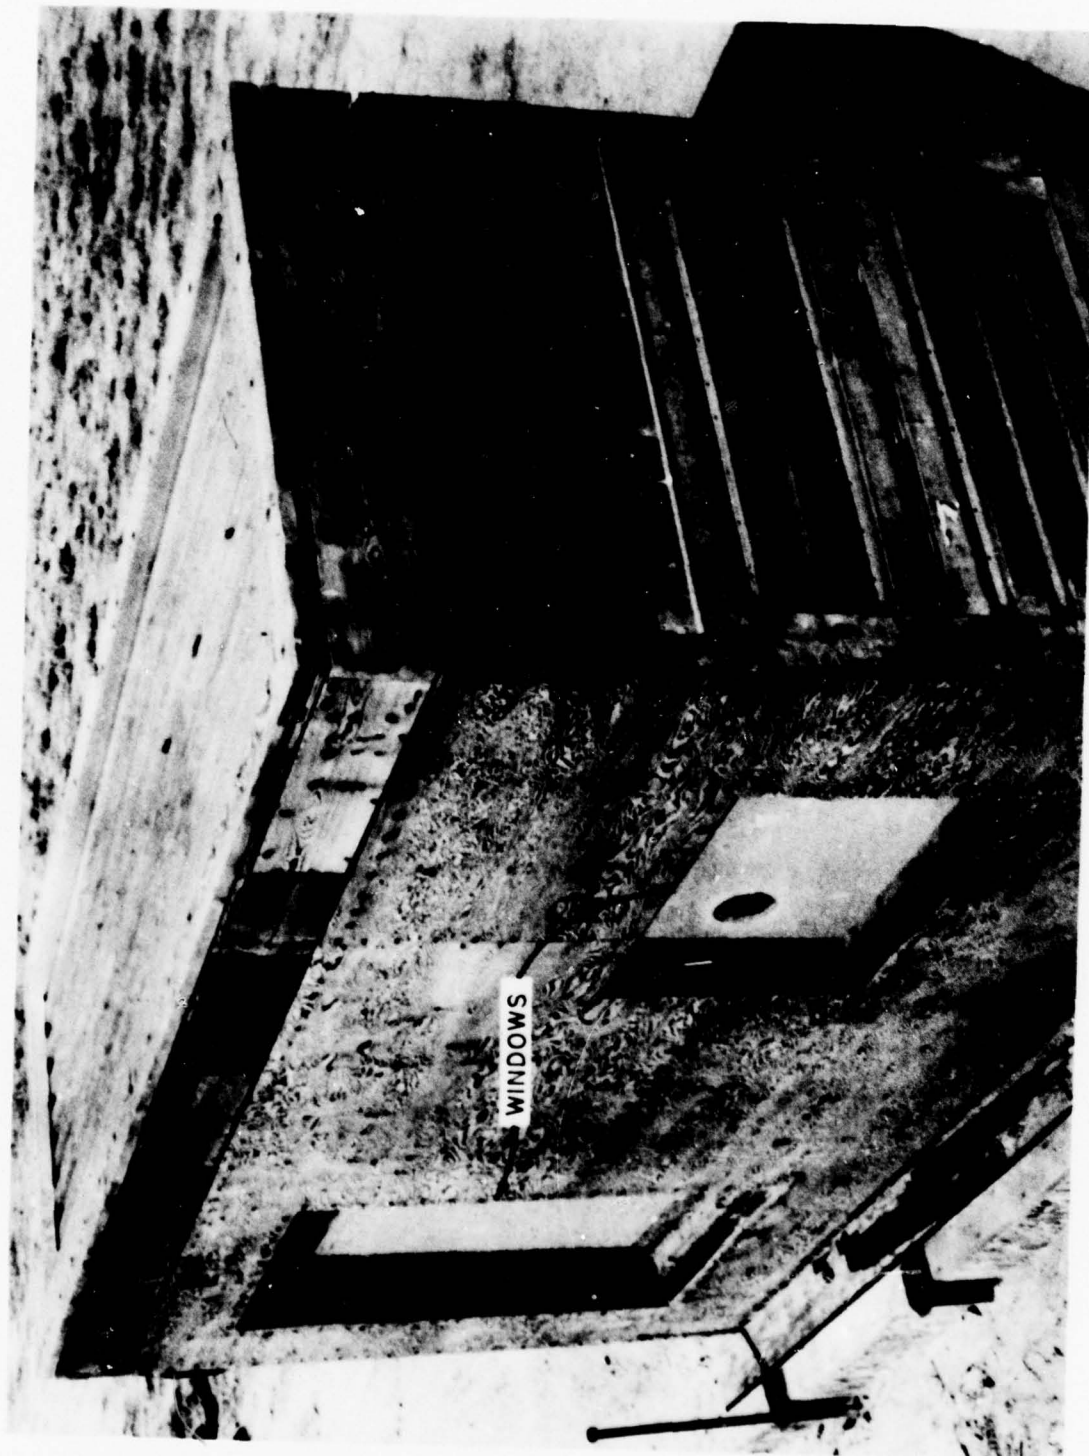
Test Structure B for Testing Steel Panels and Glass Windows
